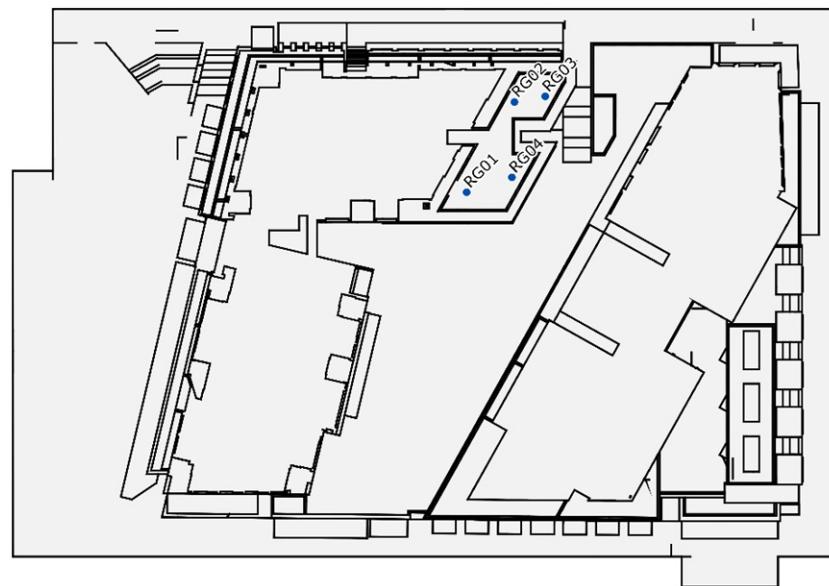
Layout of Pressure Sensors – Level 6 Plan
